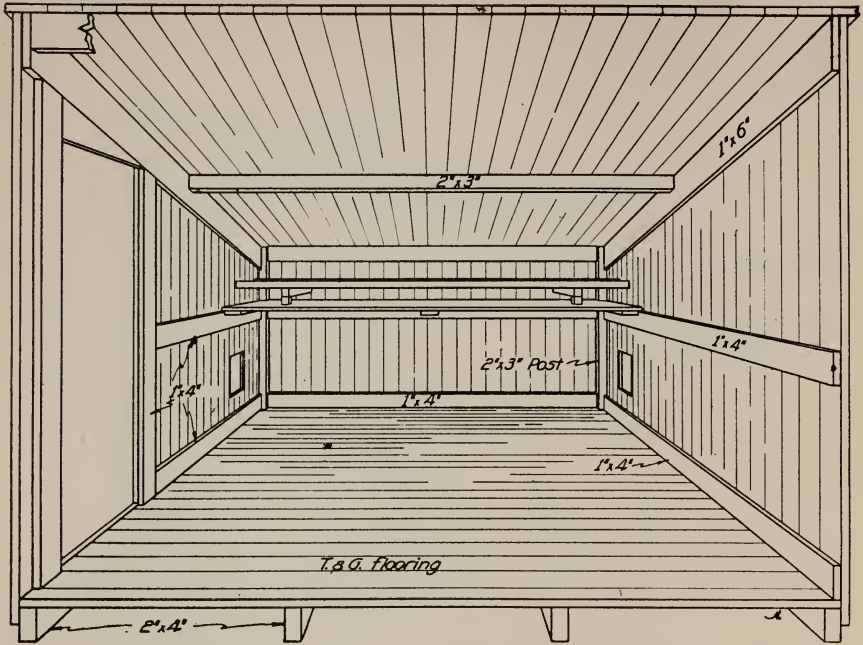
Interior view of 8 × 8 foot knock-down poultry house showing framing details.
